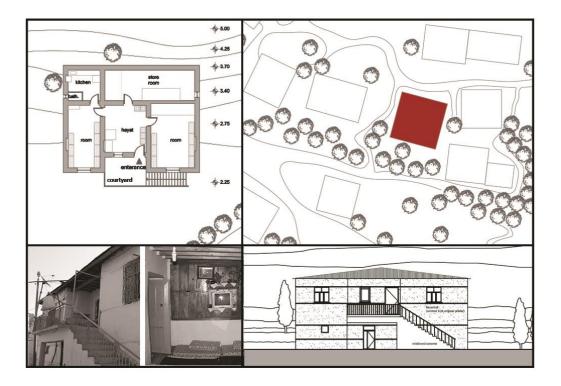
An example of the rural home: plan, site plan, view and photos (RURAL NO:18)
